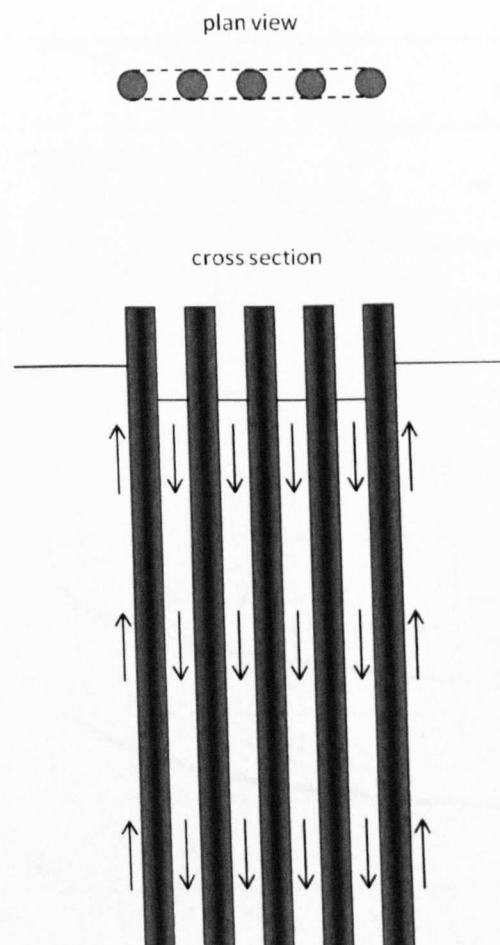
Failure planes in a bored pile wall (linear group)
